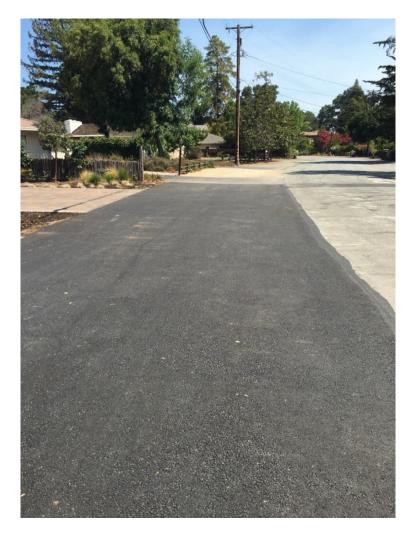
Asphalt used in shoulder parking and drainage swale area (NCE)
